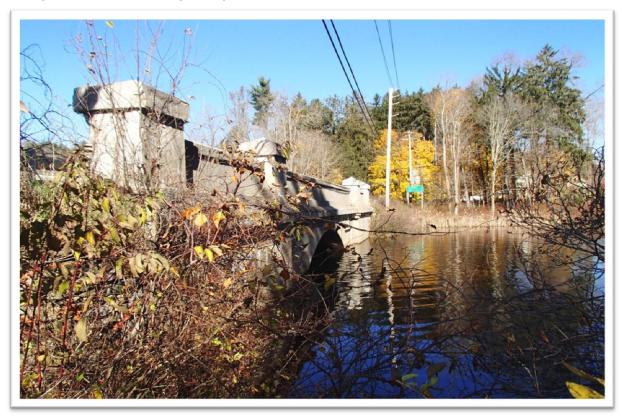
Photo C Baptist Church Road Bridge: View facing west along the northwestern bank showing wetland fringe at point B-8. Date Taken: November 7, 2018.
